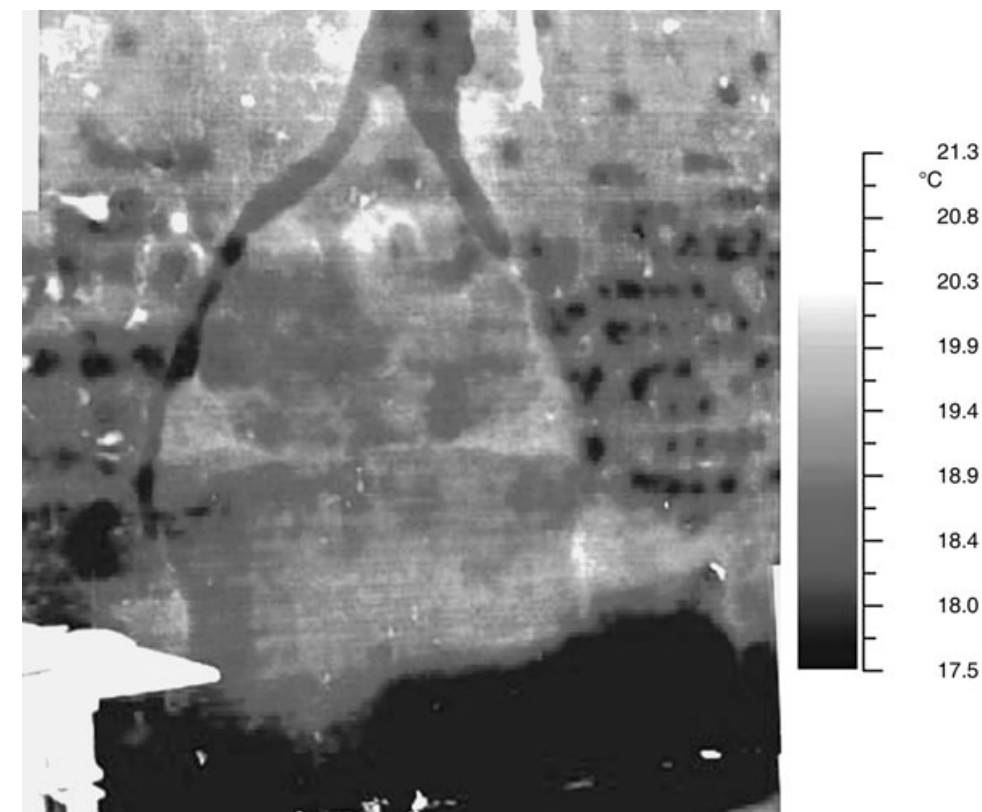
Composite IR thermograms of the northern wall (A) of room 2.1. It shows an infilled opening and arch-shaped plaster patches. The infilling of the opening consists of bricks; the surrounding masonry has a brick and cobbles texture. Uneven heating caused a colder strip at the base of the masonry. Thermograms were shot at 5600 s. A further shot, at 7200 s, showed a similar texture in the lower part of the masonry.
